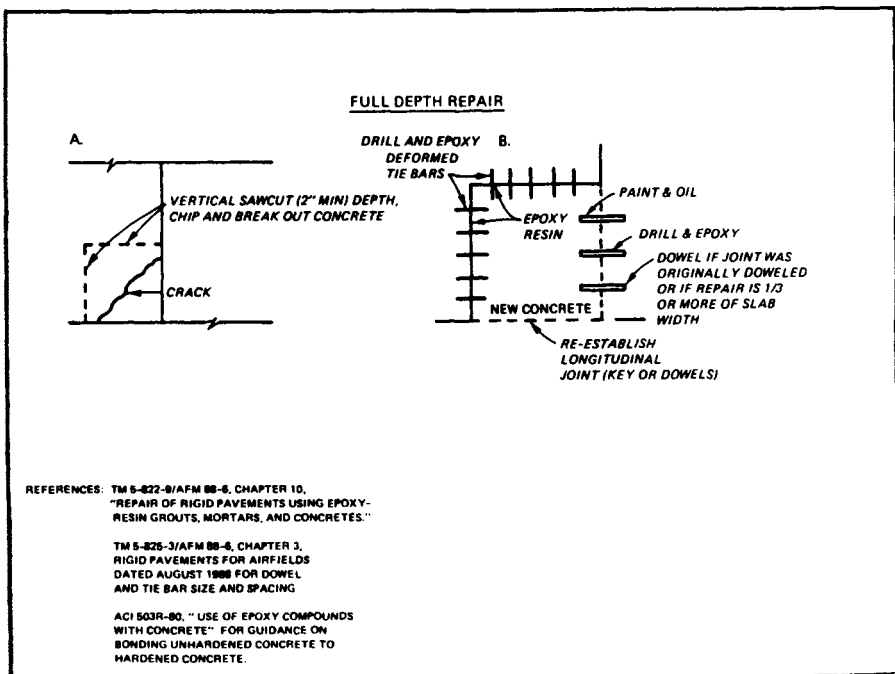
Full-Depth Patching of PCC Pavement (U.S. Army and Air Force 1988).
